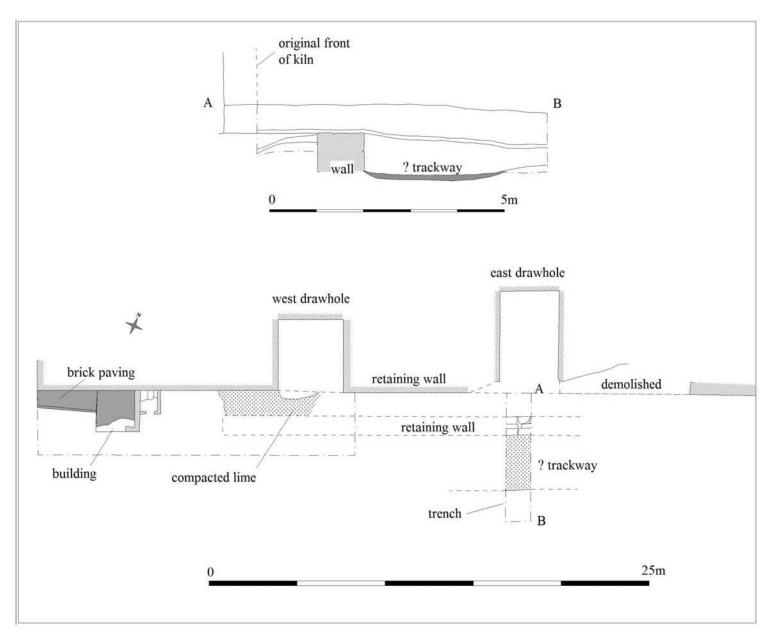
Plan of structures related to the limekilns and section of evaluation trench
